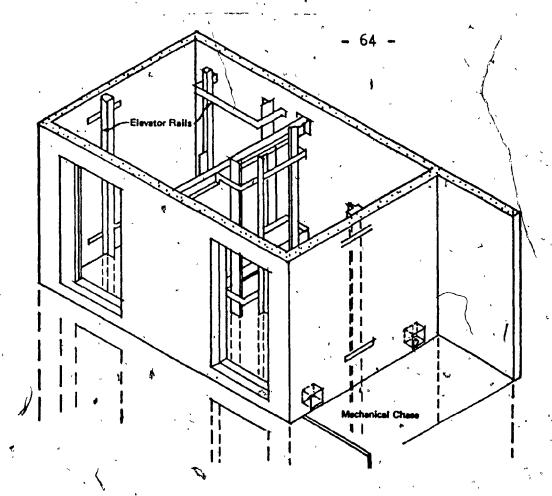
FCE-Dillon; The Elevator Module, Typical Precast Double Elevator Section (Ref. 32)
